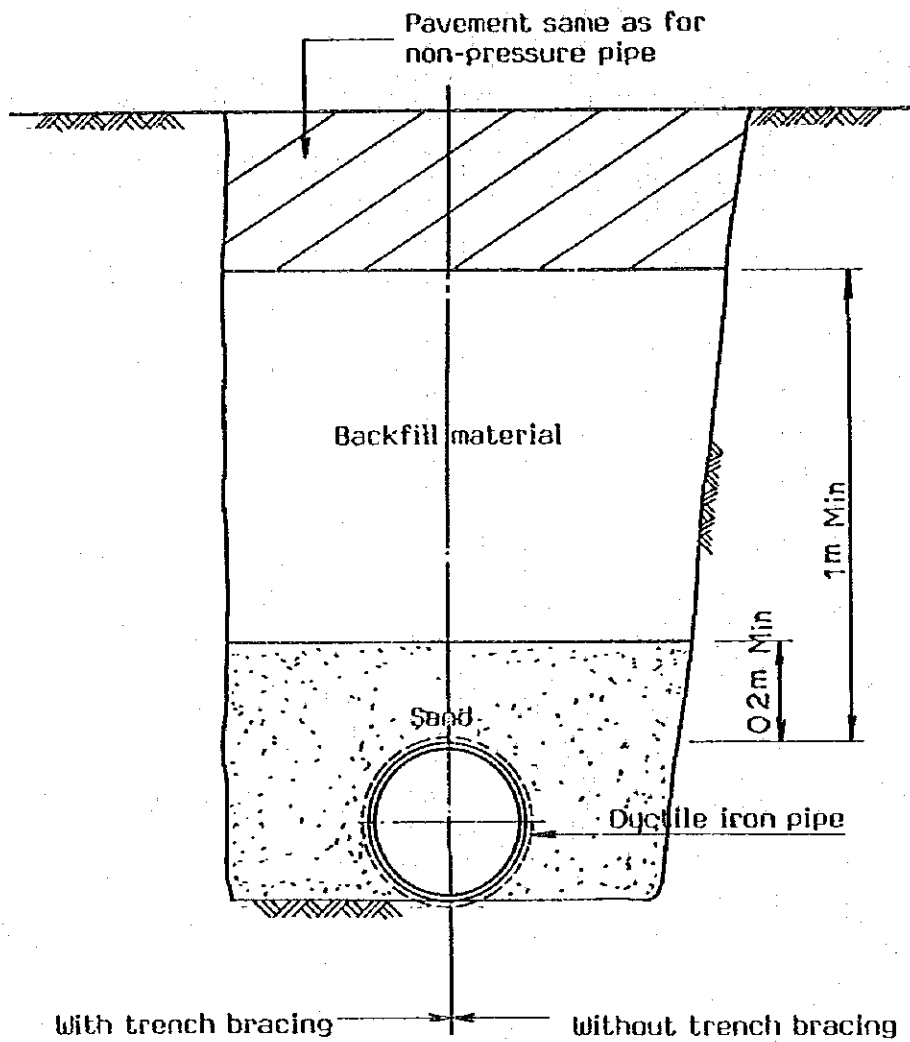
Typical Sanitary Sewer and Stormwater Tranch System
